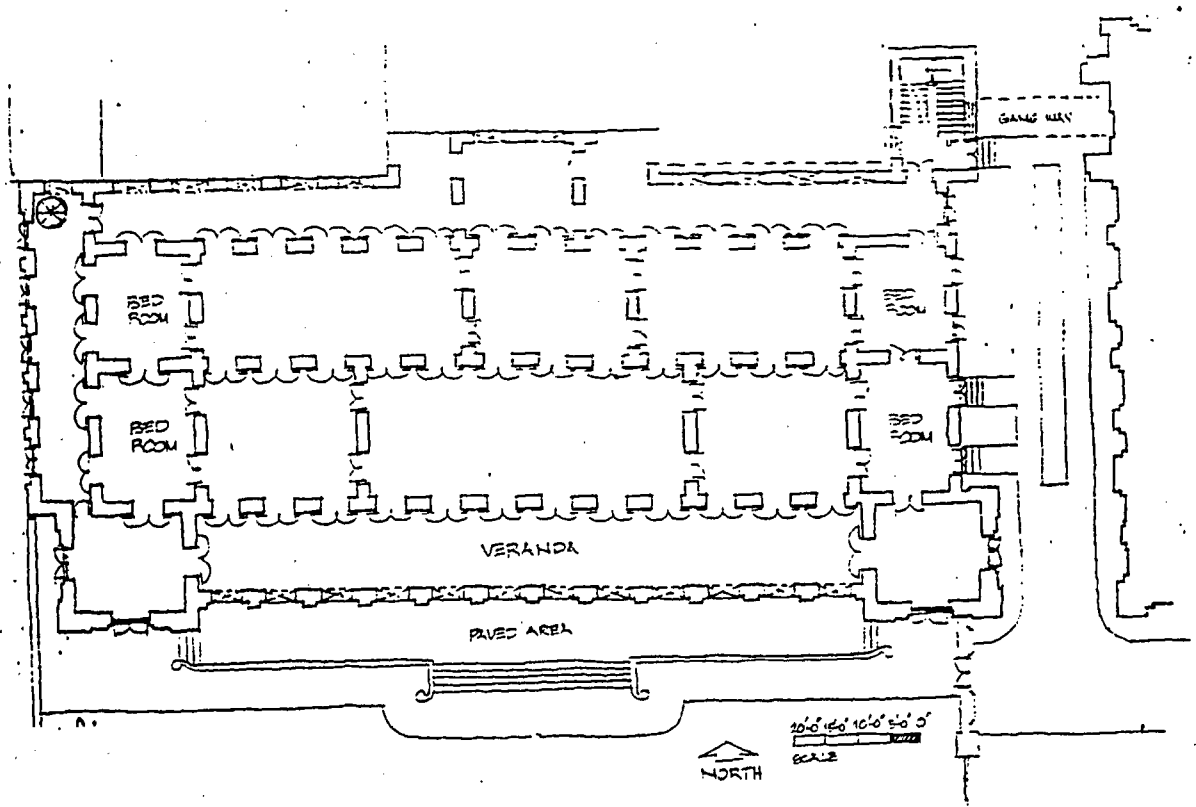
Ground floor plan, Jenana Mahal Ahsan manjil, Dhaka
